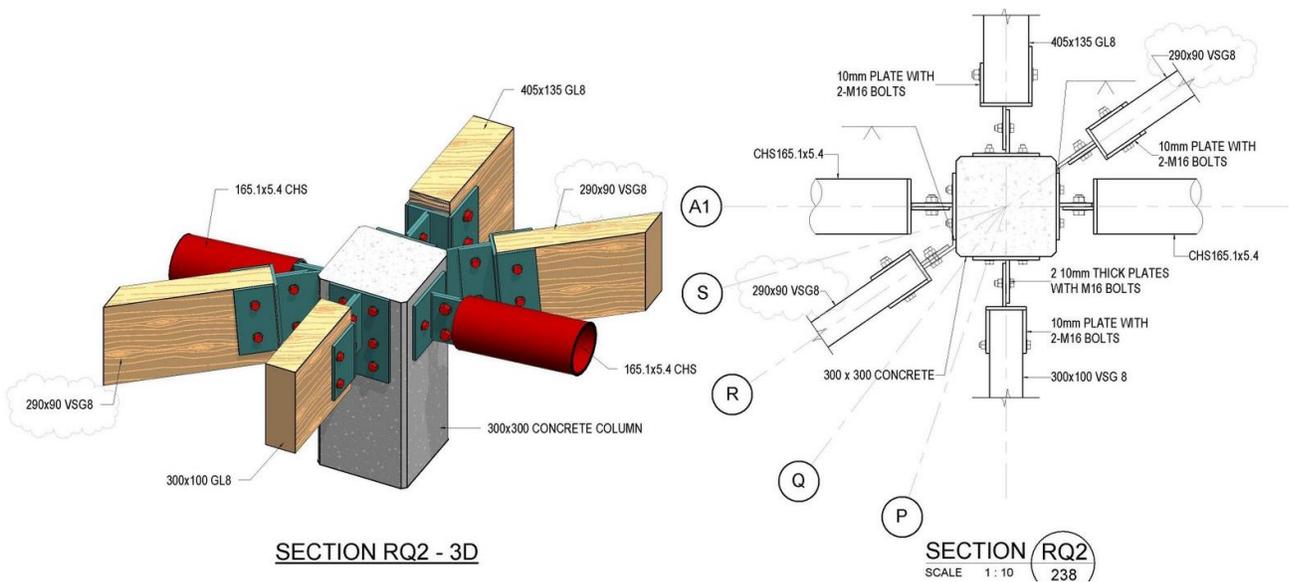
Structural Steel Connections 1 (Image courtesy of CCIT)
